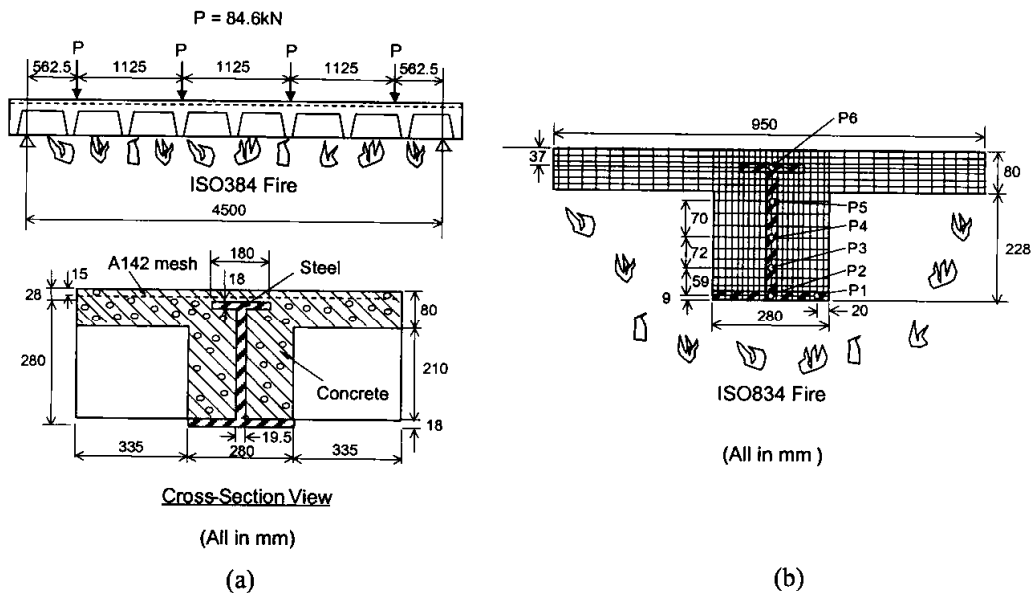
A full-scale ISO384 standard fire test on a “*Slimflor*” beam: (a) Details of the *Slimflor* beam tested; (b) The element segmentation mesh adopted.
